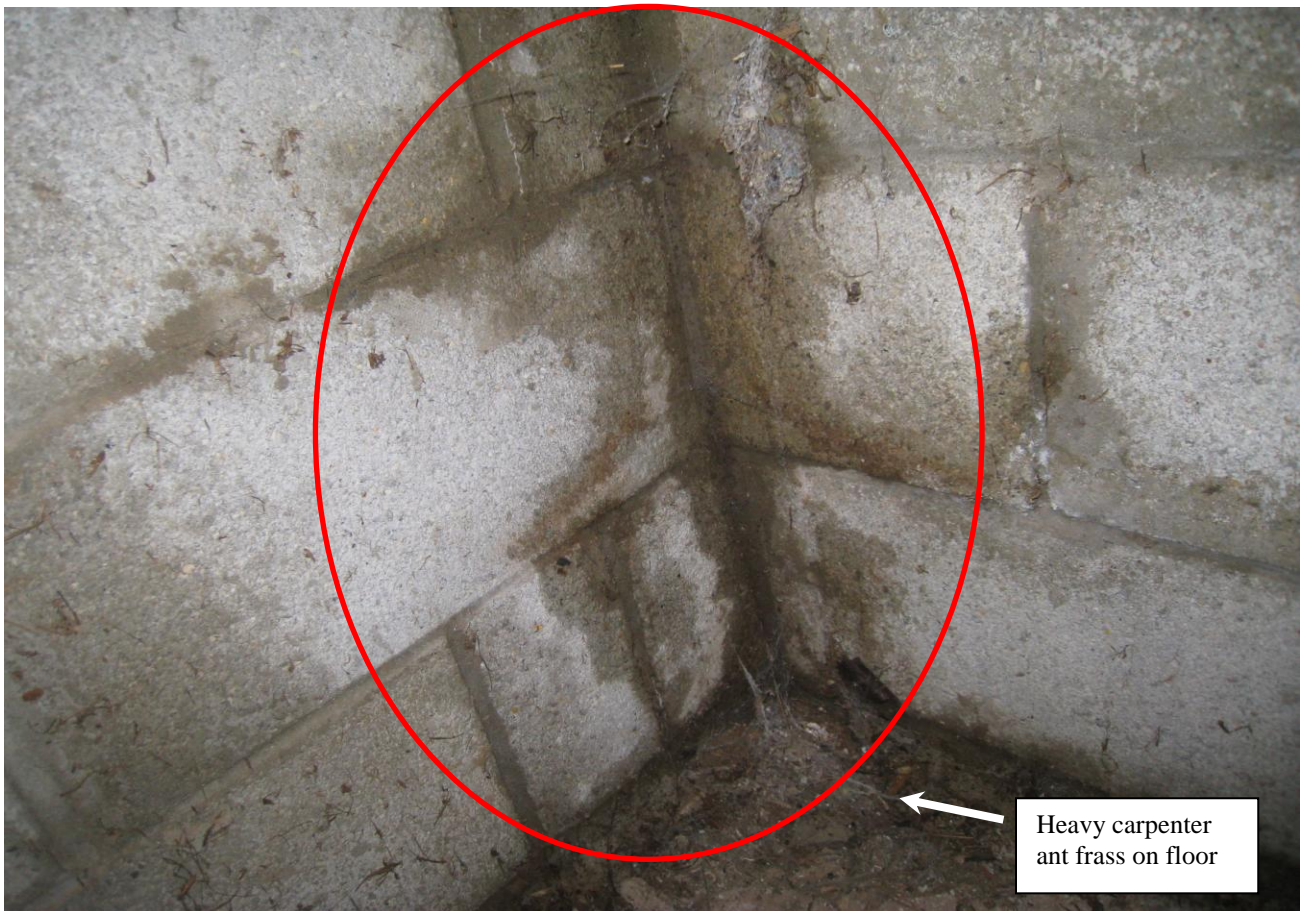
Wet walls in crawl space; correct grading and add covers on recessed access doors. Recommend keeping crawl well ventilated to avoid mold, water or structural damage and attracting wood destroying insects. There was heavy carpenter ant frass on floor, sills and walls in crawl space. Recommend proper treatment; ask Association who is responsible for treatments.
